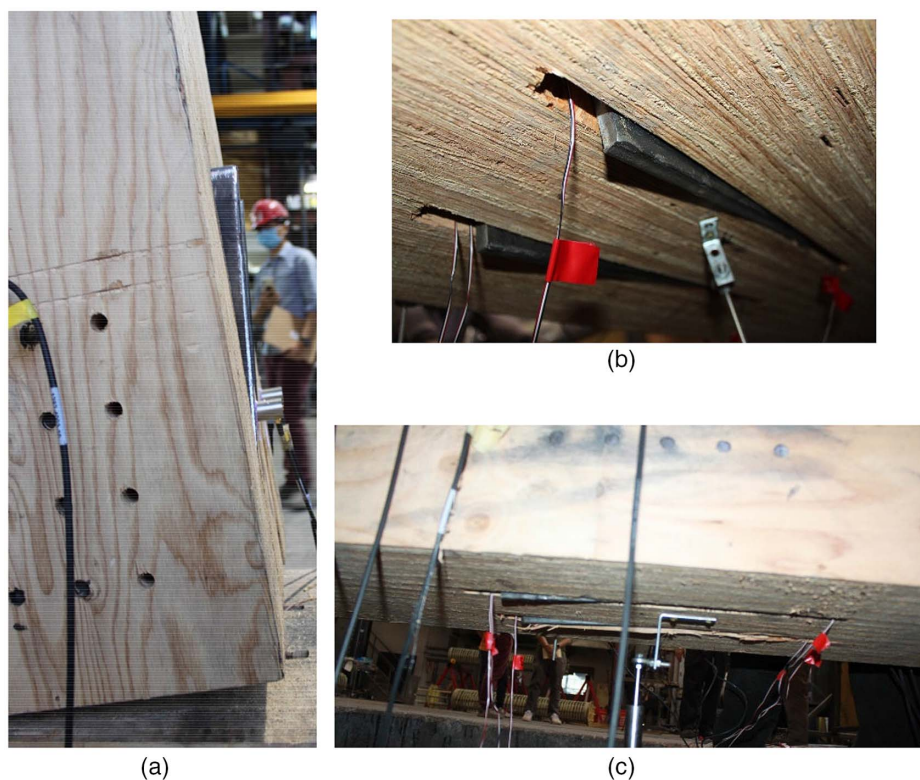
Joint rotation observations: (a) plates extend beyond west face of beam; (b) plate extension beyond joint 20M column; and (c) plate extension beyond joint 16M column.
